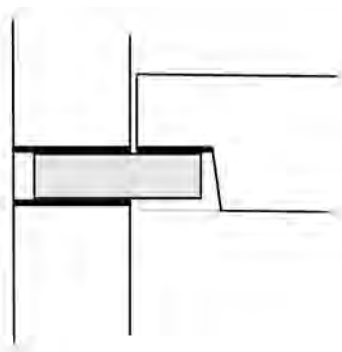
Section through steel connector encased in wall and fully grouted into preformed pocket in precast landing.
